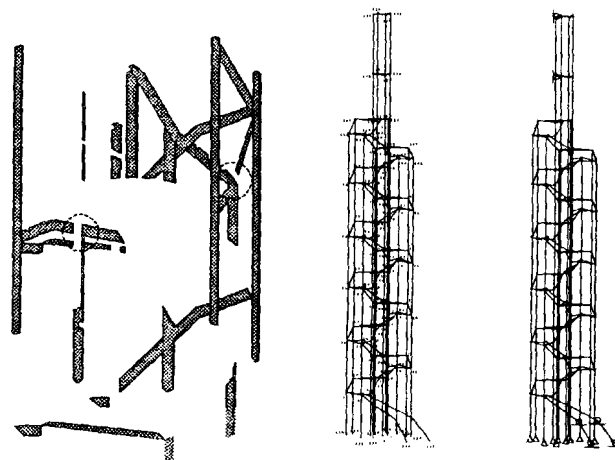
Twin new stairs: plan configuration, structure view, SAP model utilized to assess performance under heating
